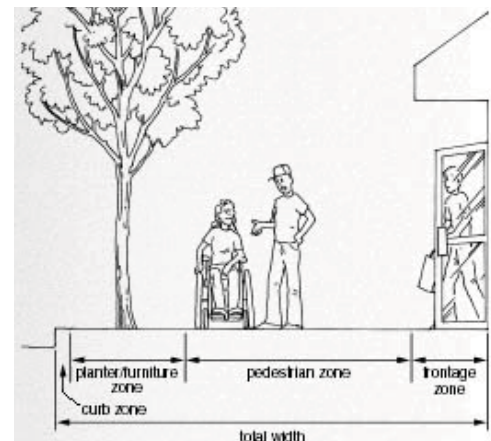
Sidewalk Zones, FHWA(2001)
